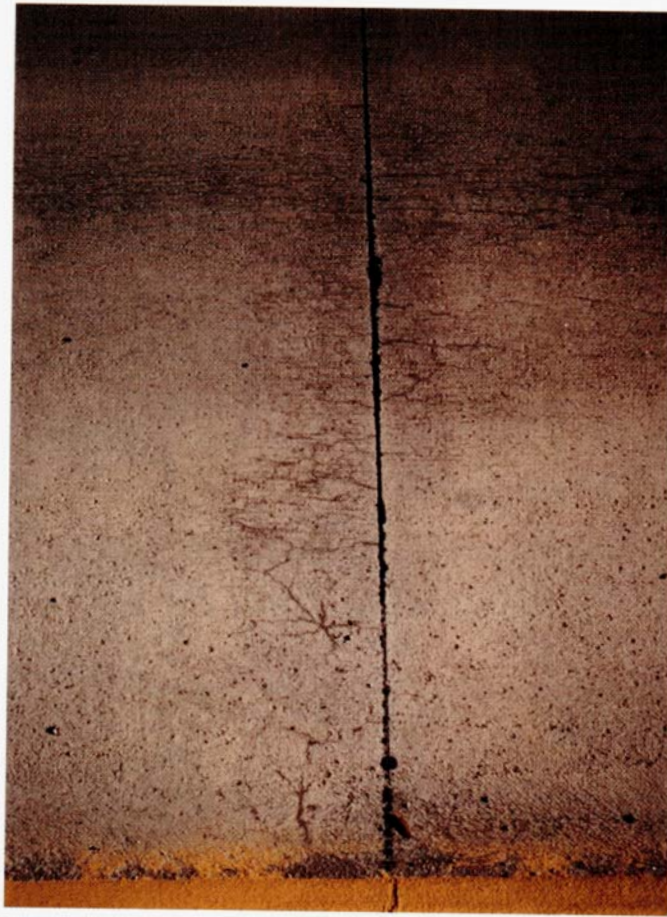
Severe cracking associated with ASR in continuously reinforced concrete pavement (CRCP). Cracks are most frequently oriented in longitudinal direction of pavement (top to bottom in photo), and are interconnected by finer transverse or random cracks, producing a generally rectilinear crack pattern. Relatively smooth wearing surface shown in photo, in contrast to grooved and textured surfaces, enhances appearance of cracks.
